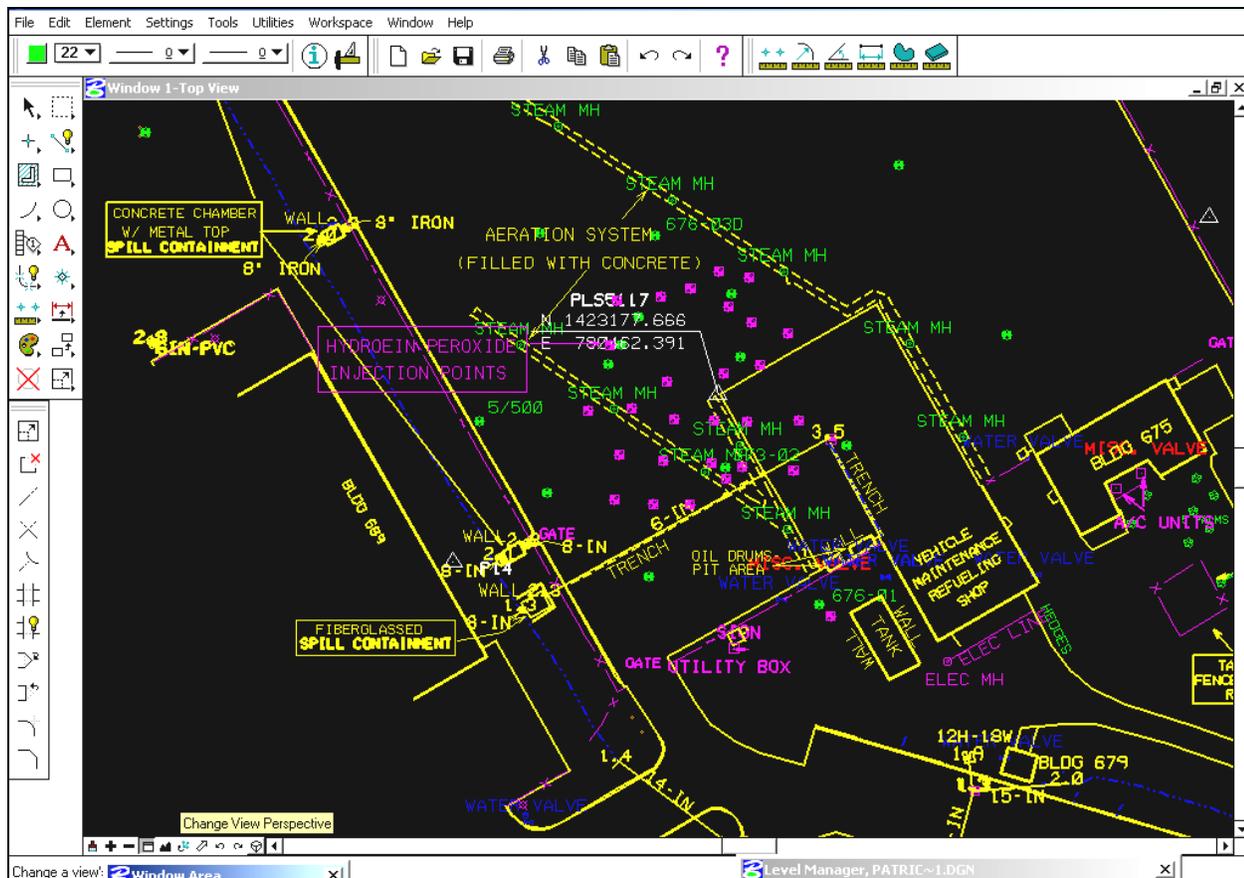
Utilities near a Vehicle Maintenance Refueling Facility at Patrick Air Force Base, Florida (Louisville District--2004)
